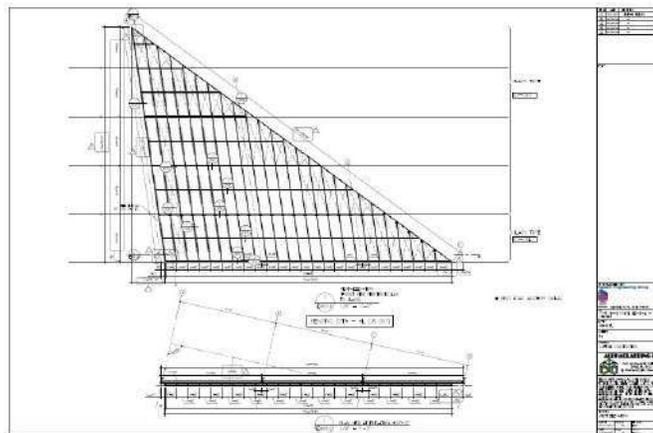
Project Plan Drawing of the West Inclined Curtain Wall of The Royal Caribbean Cruise Terminal (Source: Eastern Engineering Group)
